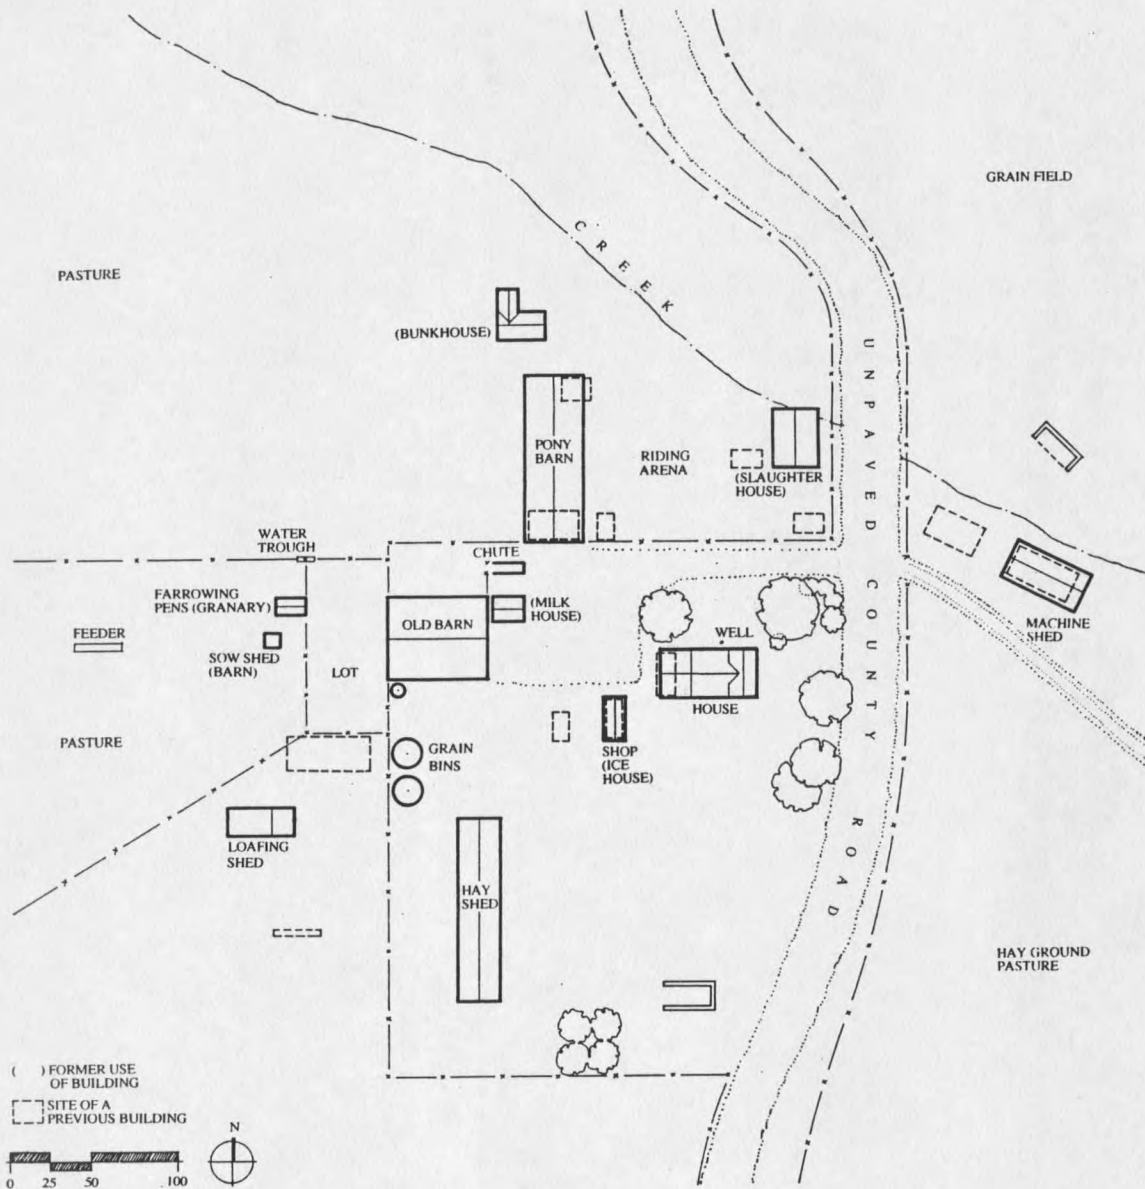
Site #1 - Site plan from 1931 to 1975. Six new structures were built, while seven were demolished, two were moved, and the house was added on to seven times.
